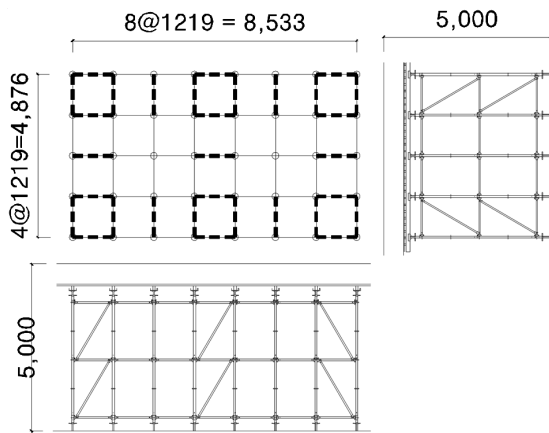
Standard drawing for concrete slab ($300 < t \leq 600$ mm).
